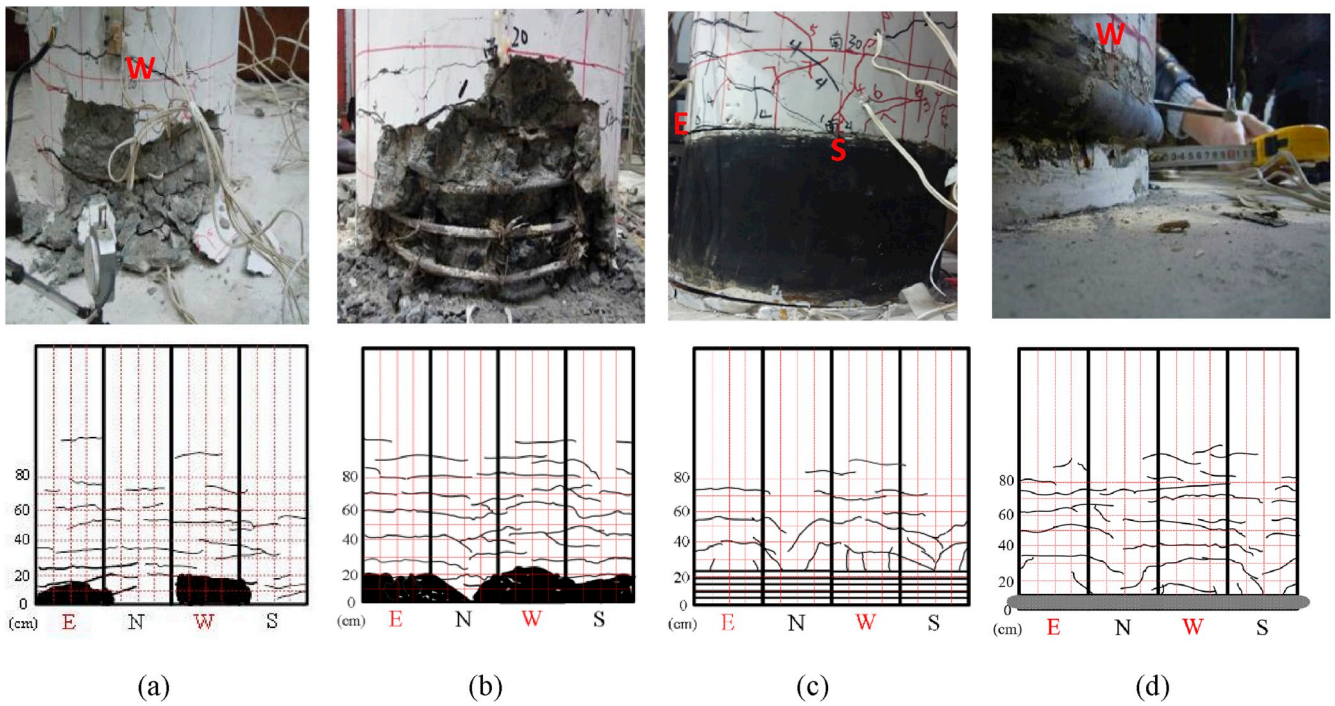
Failure modes of the tested RC bridge column specimens: (a) CIP; (b) GCP; (c) GCP-M; (d) GCP-S.
